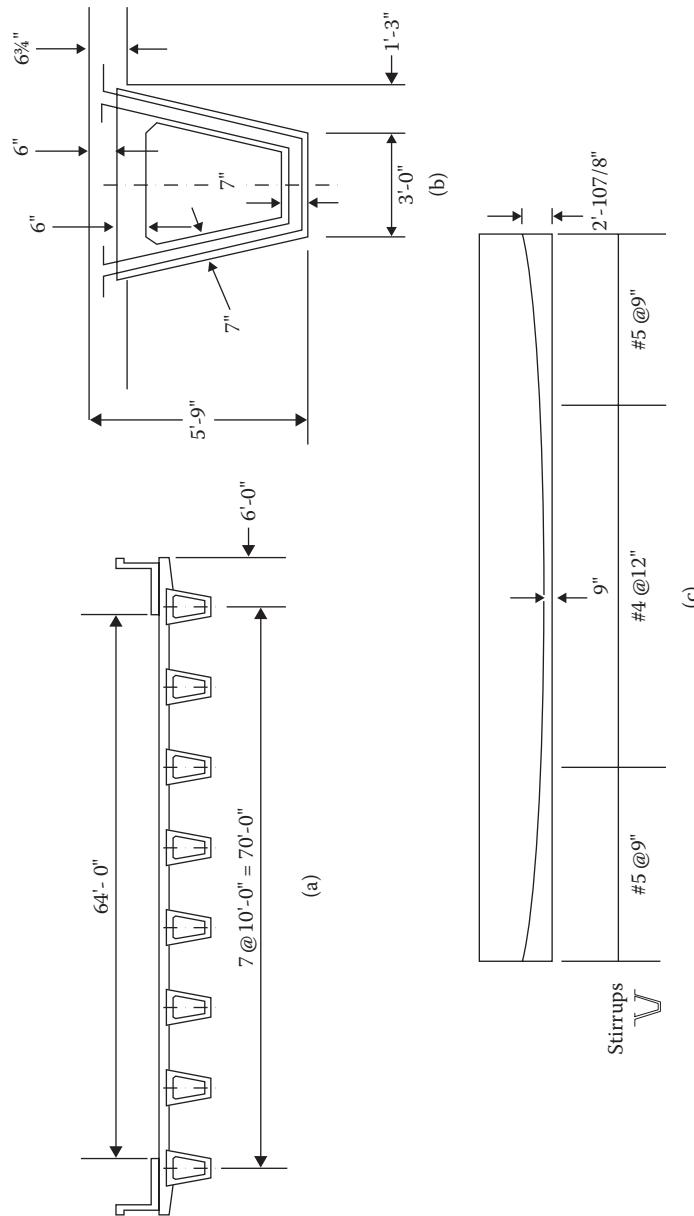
Details of two-span continuous prestressed precast box beam bridge example: (a) Typical section, (b) beam section details, and (c) prestressing tendon profile.
